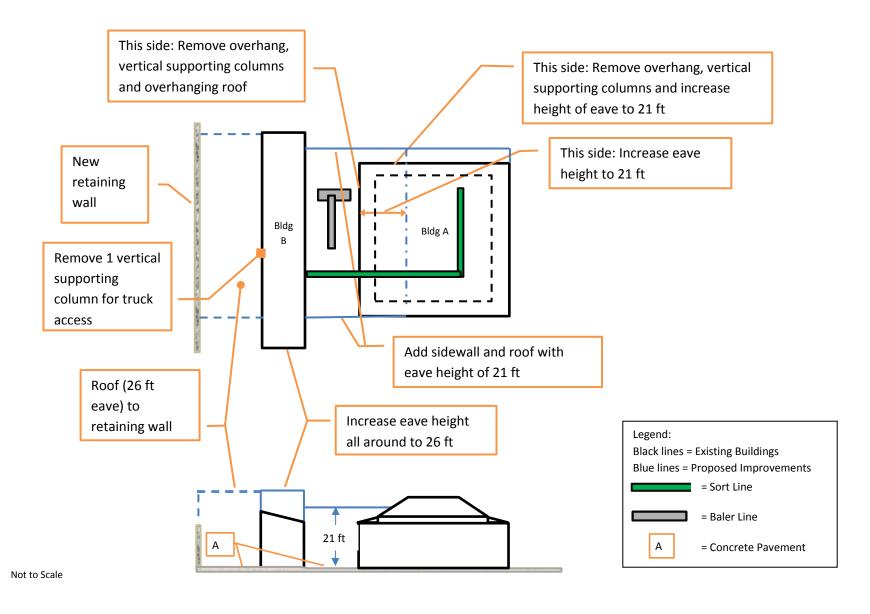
Plan and Elevation Views of Proposed Clean MRF Building, including Processing Line Configuration and Proposed Improvements
